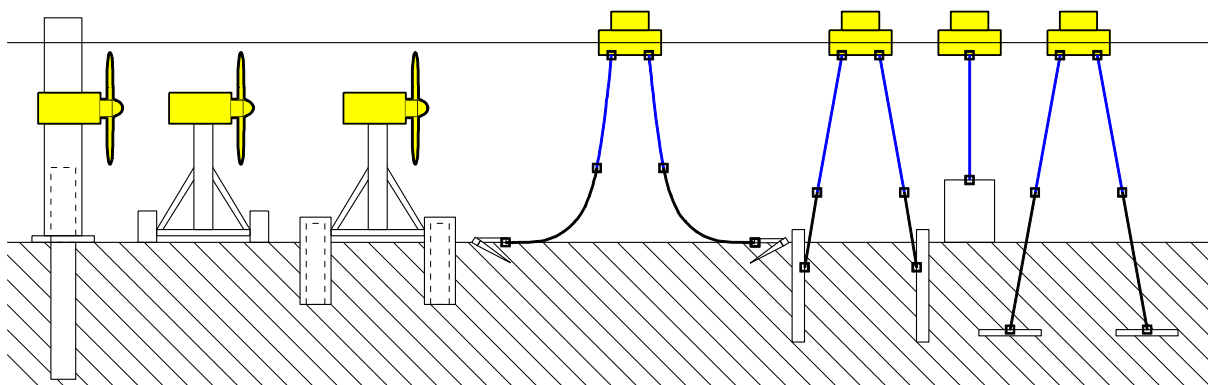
Schematic of possible foundation arrangements for MRE devices: (from left) piled foundation, gravity based structure, suction pile or caisson and several anchor types (drag embedment anchors; DEAs, pin piles, gravity based anchors; GBAs and vertical loaded anchors; VLAs) reproduced from [34].
